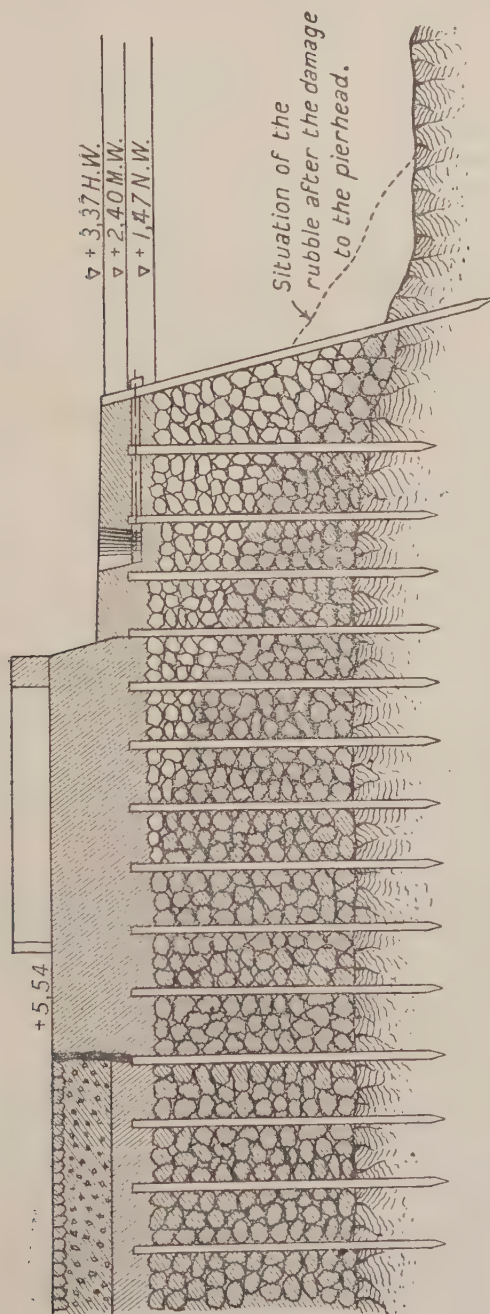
Longitudinal Section of South Pierhead at Pillau.
